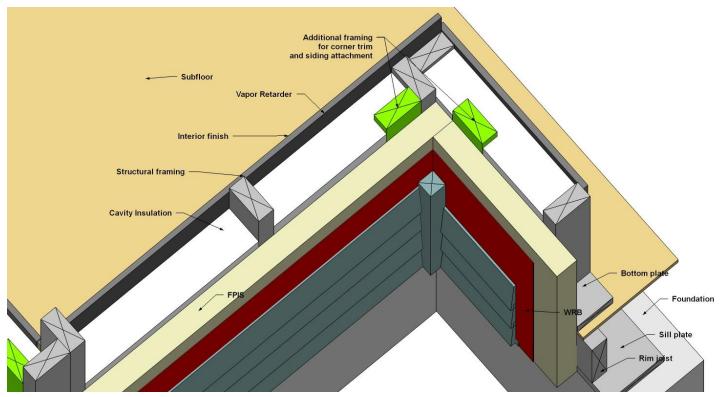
Inside Corner: Wood Frame Wall with Continuous Insulation, FPIS, WRB, and Lap Siding without Furring (Provide sufficient framing to attach siding trim and siding as well as interior finish.)
